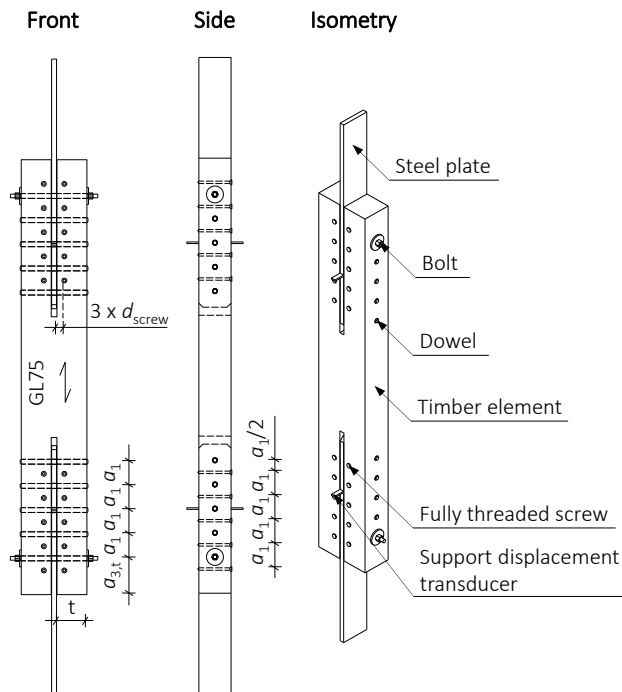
Example of a tensile test parallel to the grain specimen with 1 x 5 fasteners per connection and screw reinforcement
